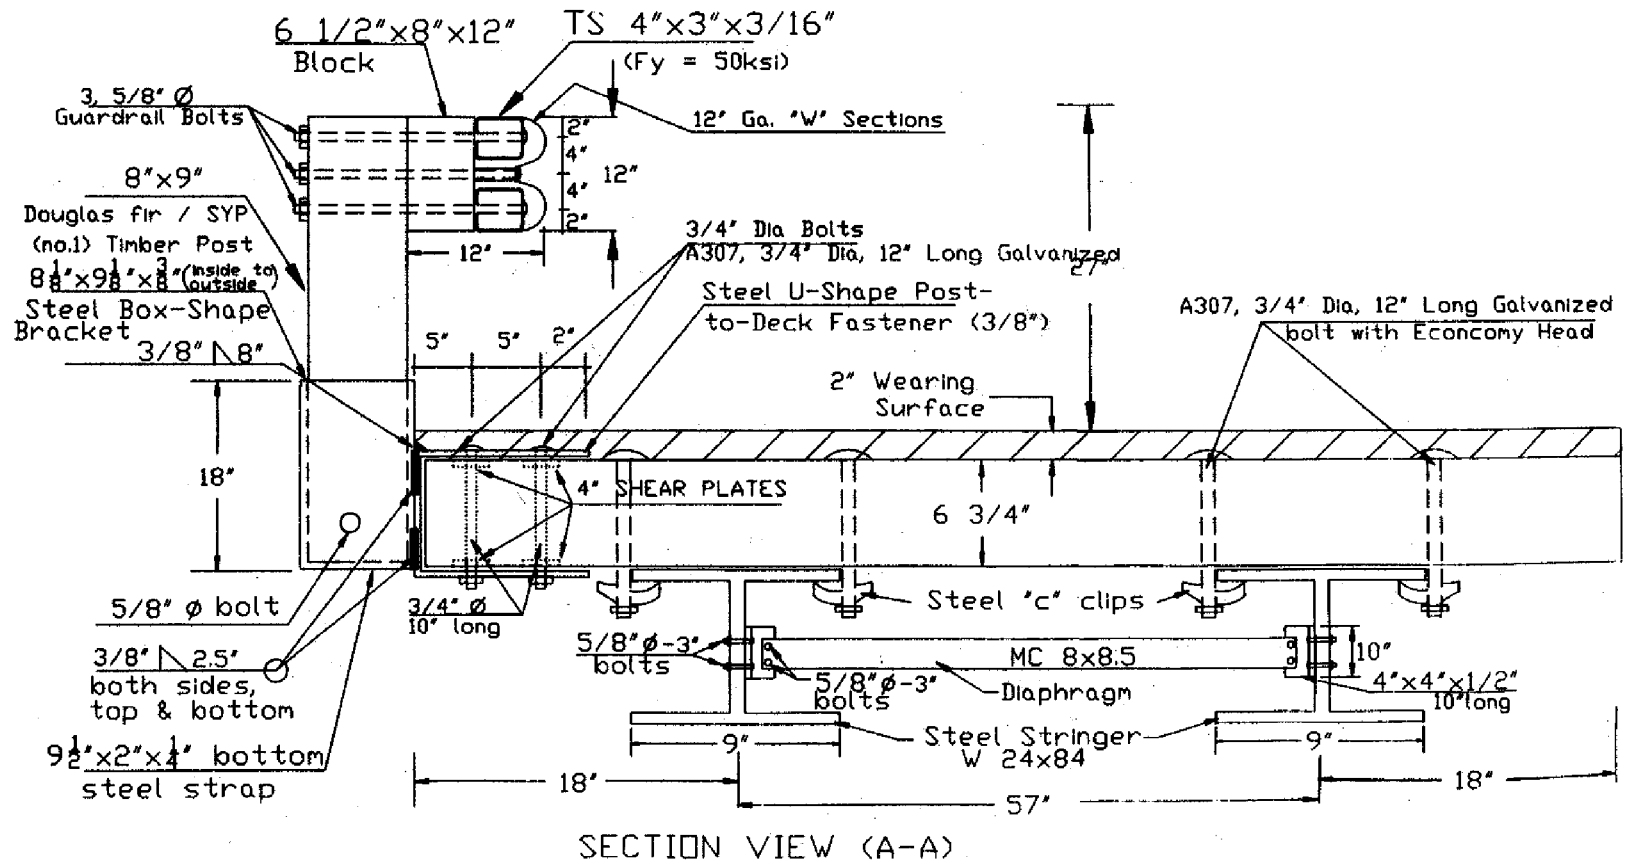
Timber Bridge Rail, System 3 (101,99).
